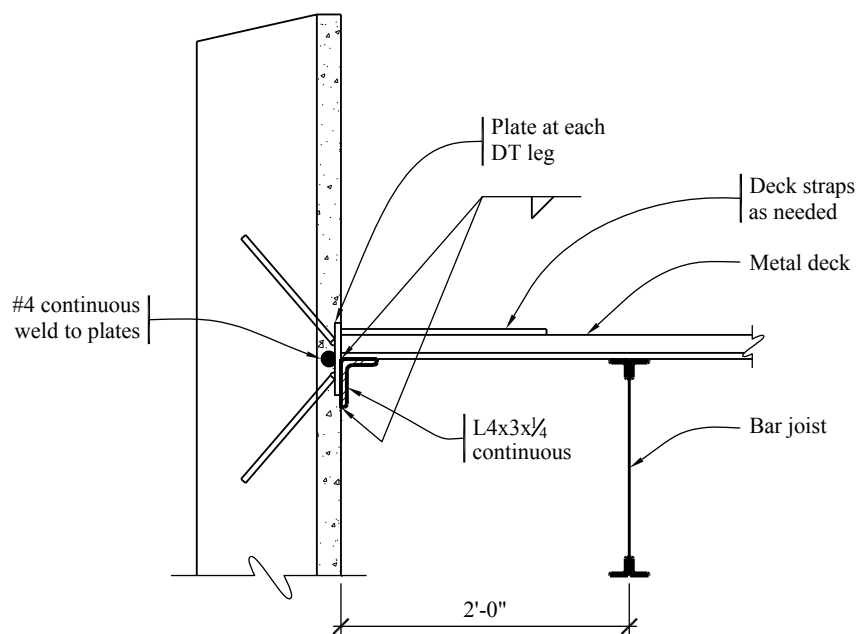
Sketch of connection of non-load-bearing DT wall panel at the roof
